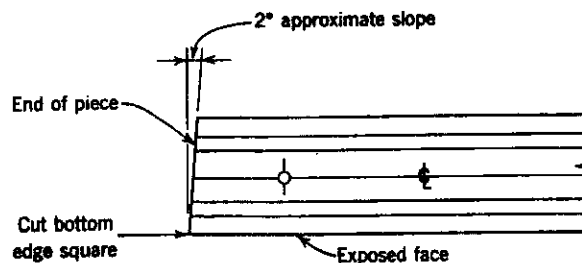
Beveled End Cut. (Beveled end cut is optional.)
